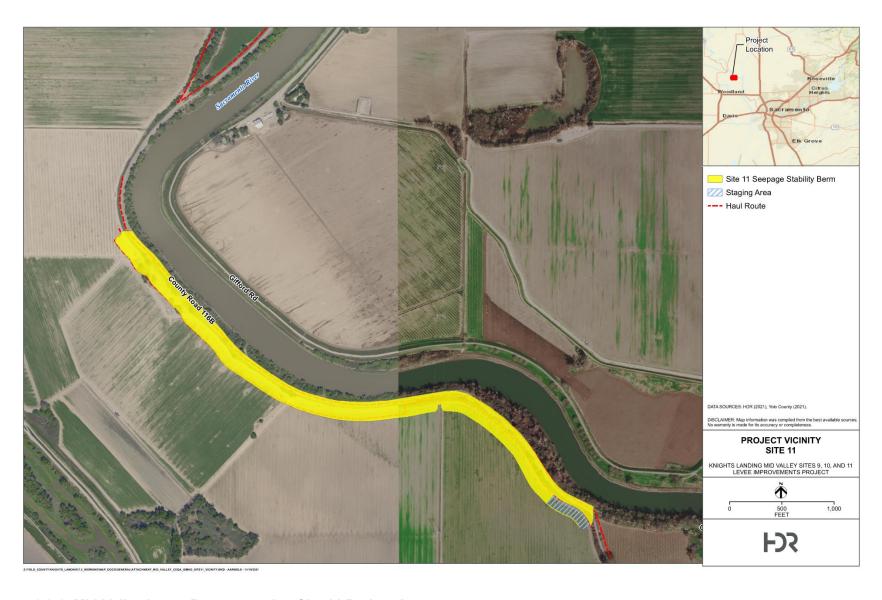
Mid-Valley Levee Reconstruction Site 11 Project Area
